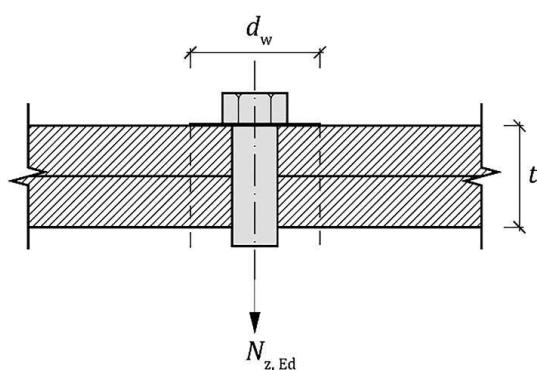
Pull-out failure caused by bolt tension force.
